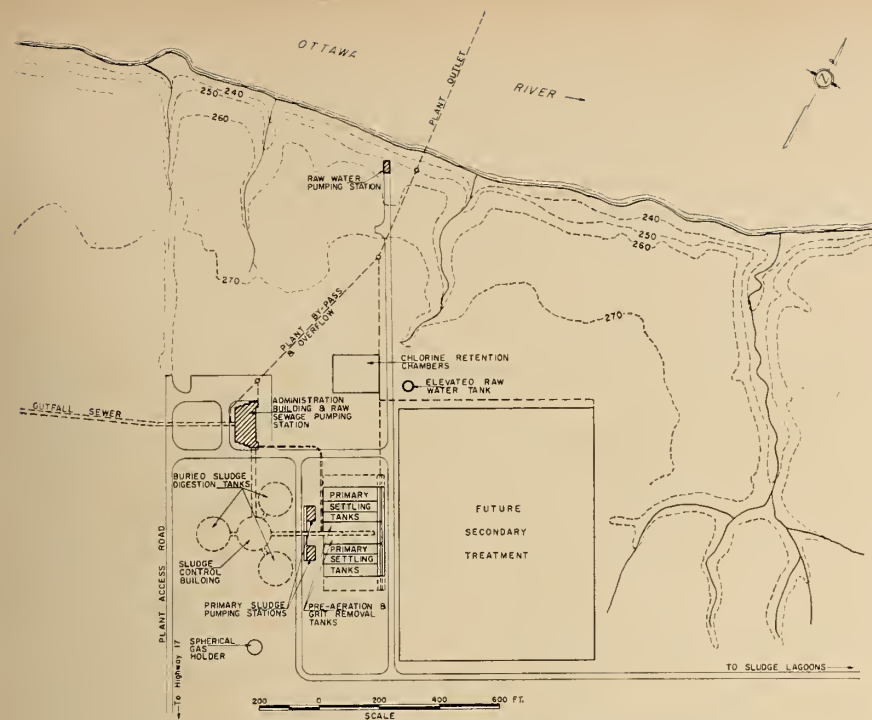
Main layout of Ottawa Sewage Treatment Plant.
